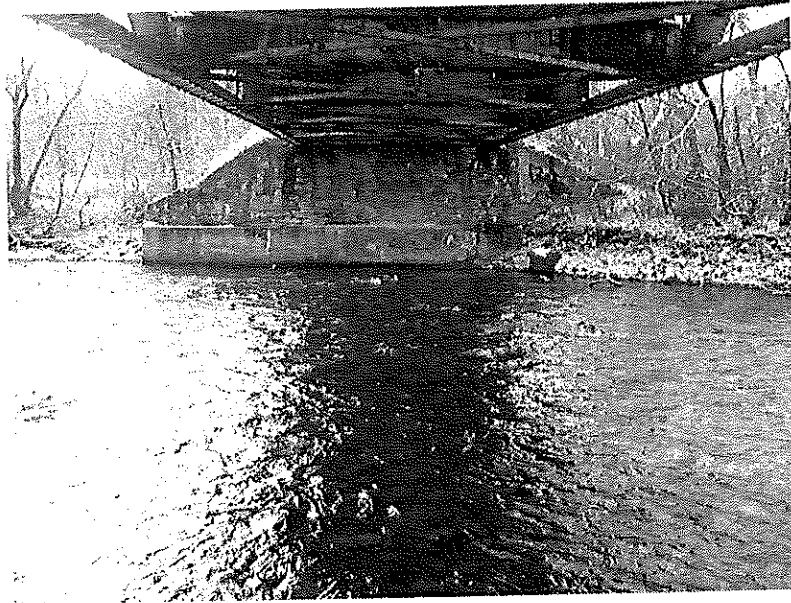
View to the North from the South Bank showing Corrosion of Supporting Members below the Deck and Condition of the North Bank Abutment
